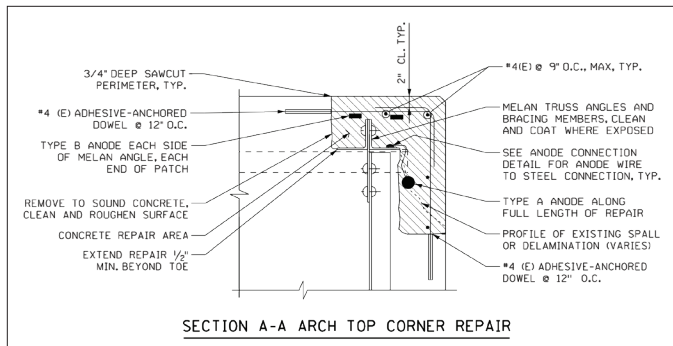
Typical detail for arch corner repair where concrete was unsound
